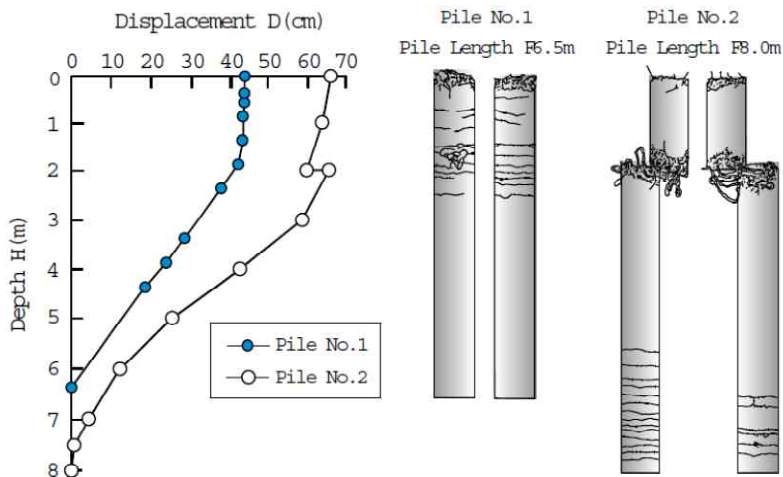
Damage to foundation piles and deformation (Hamada et al., 1992)
